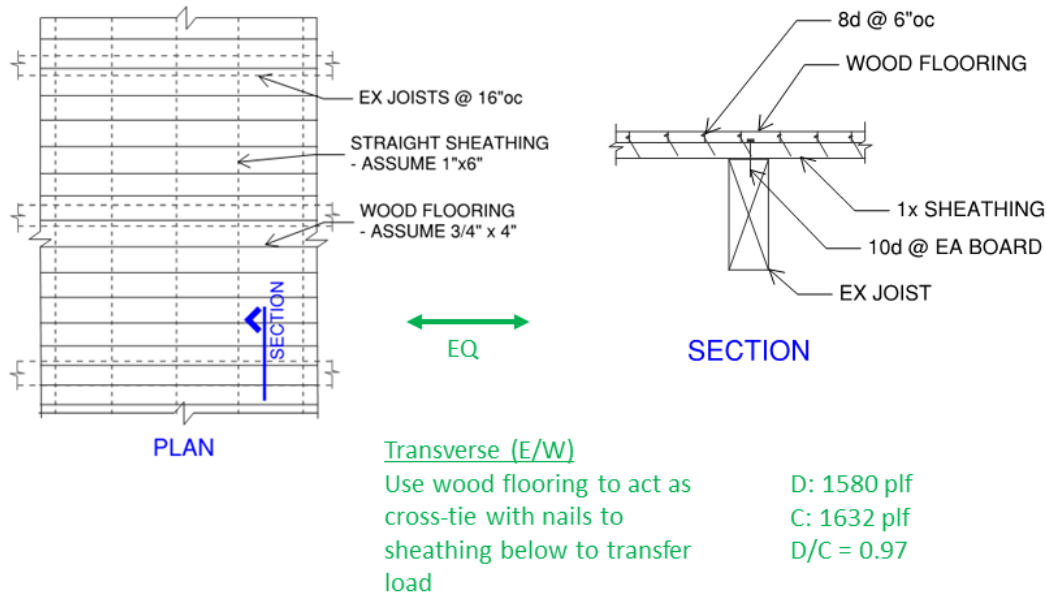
Wood flooring over straight sheathing—transverse direction.
